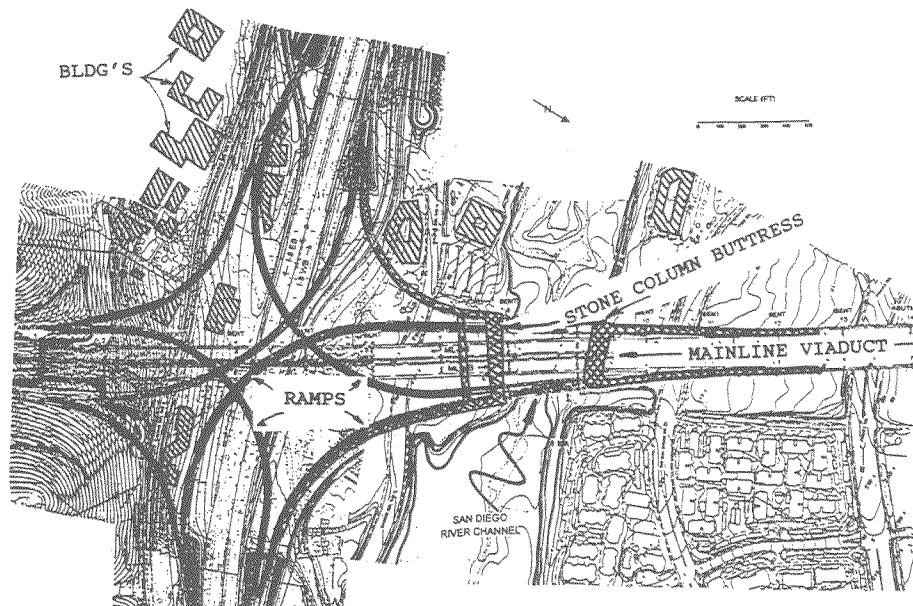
Plan View of I-8/805 Interchange Showing Location of Underground Stone Column buttress
